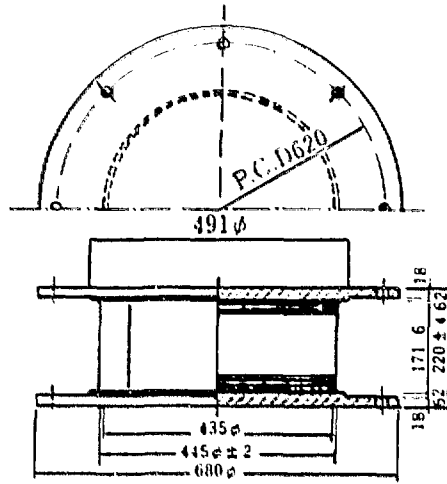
Dimensions of Laminated Rubber (High-Damping Rubber)
